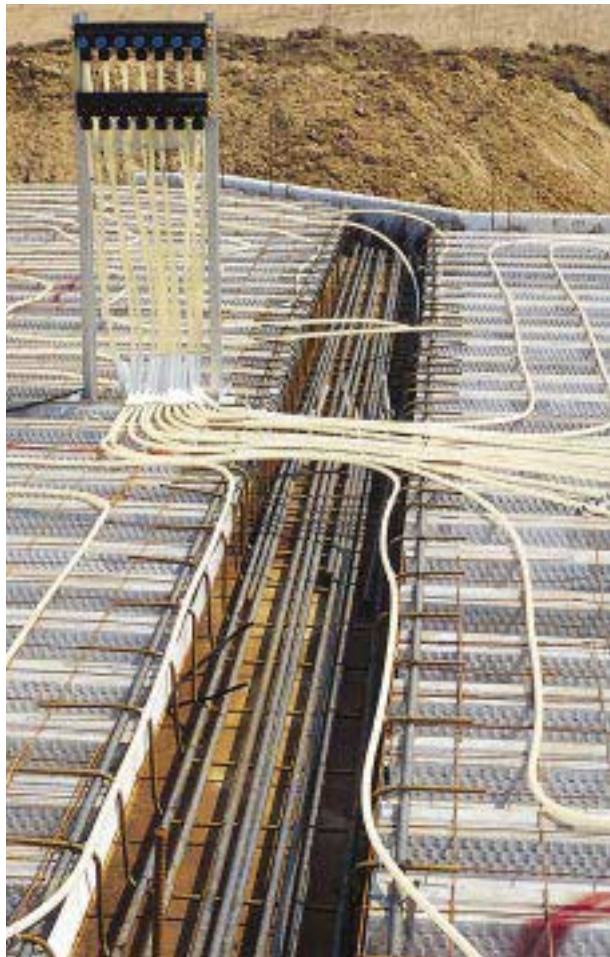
Figure C. Long spans are permanently supported with structural steel or, as shown here, by a reinforced grade beam poured monolithically with the slab.
